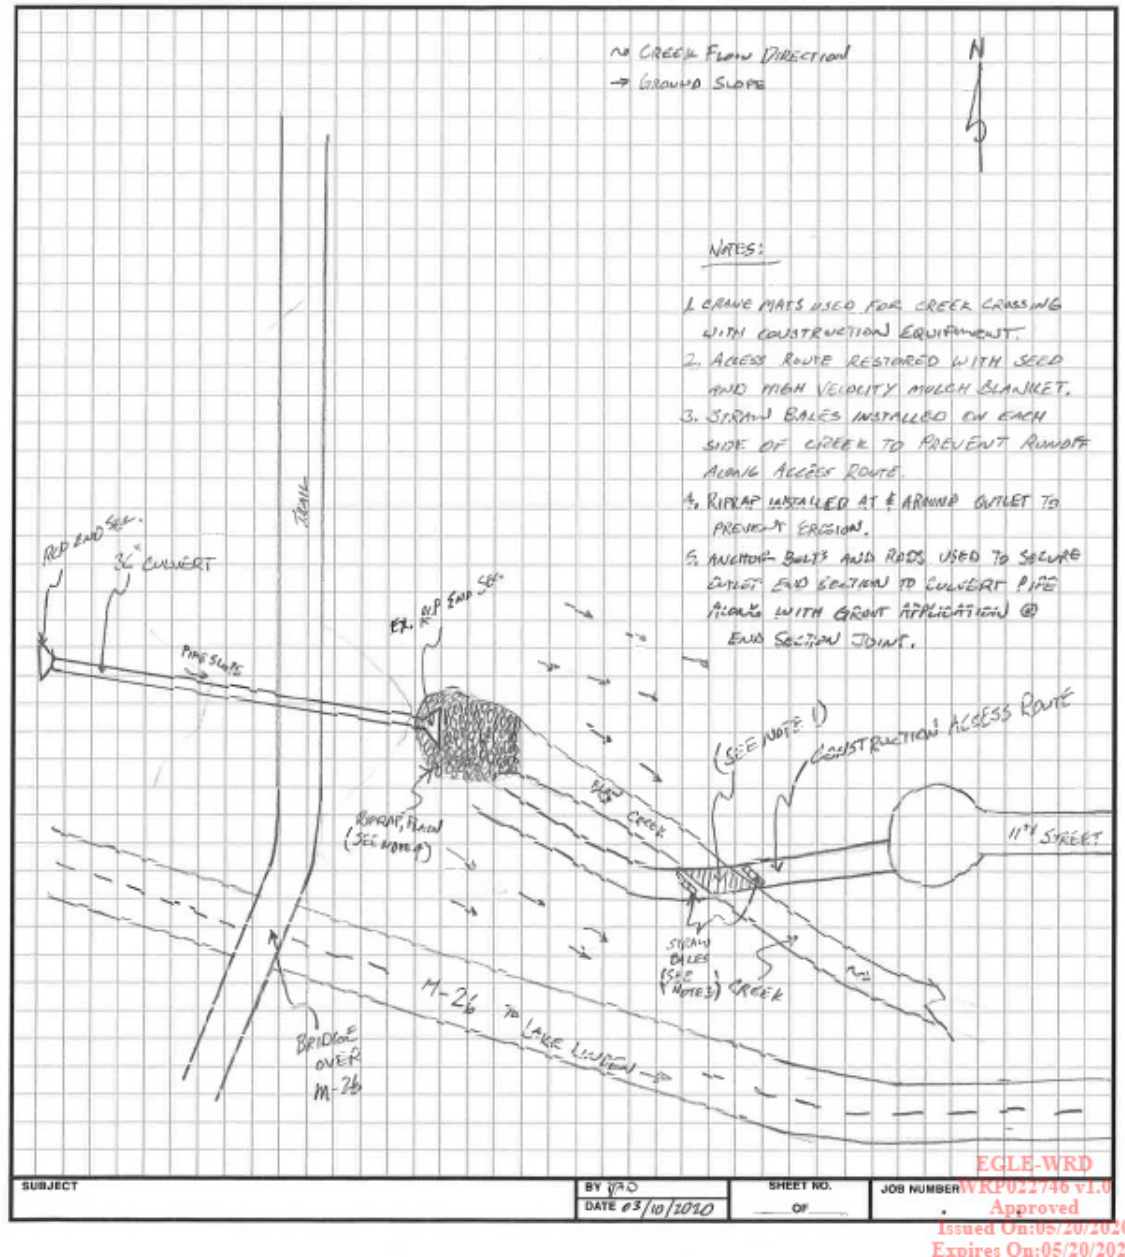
OHM – MDNR Rail Grade Plan – LLCC21 [18].
